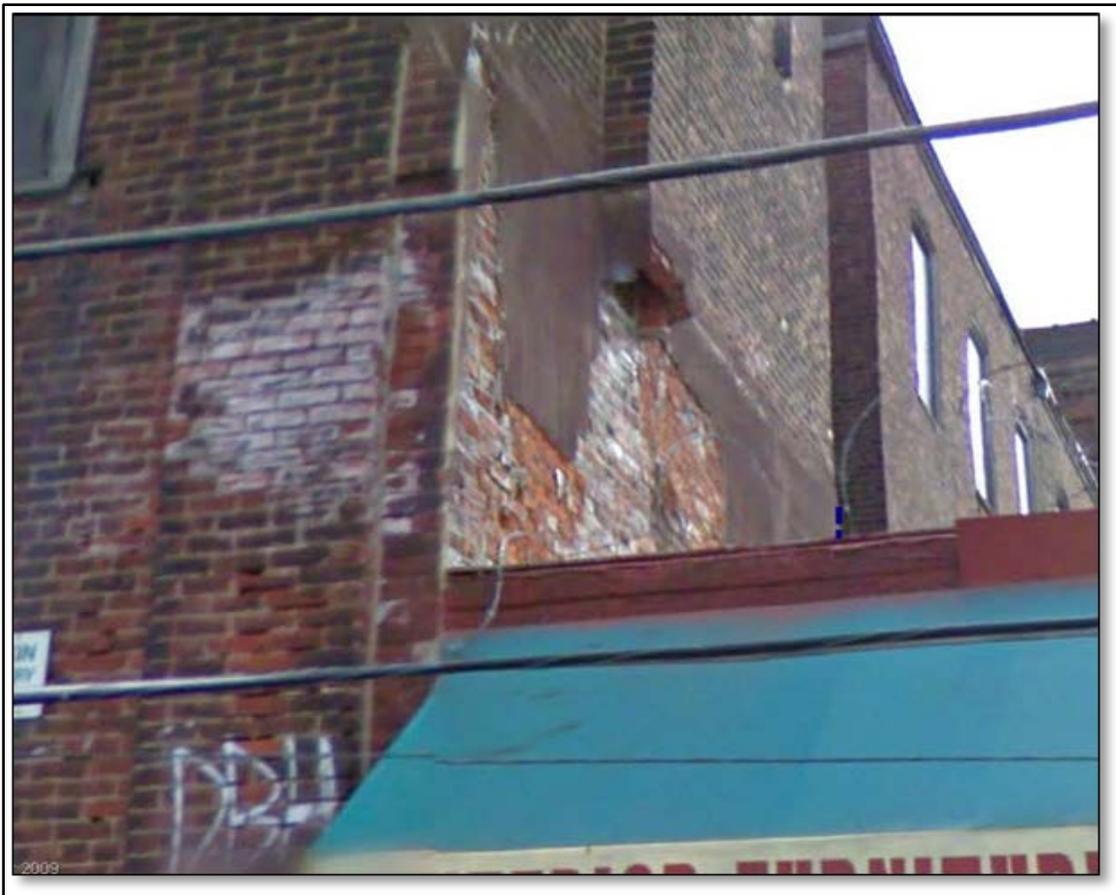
Pre-fire detail of north perimeter of Building #2, Side A exposure.
